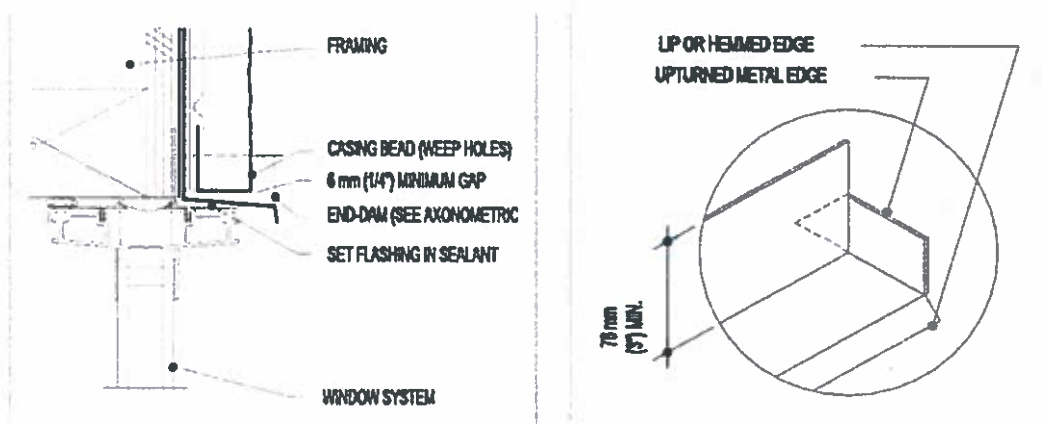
End dam for window head. Note also that the flashing drip edge extends far away from the wall.
